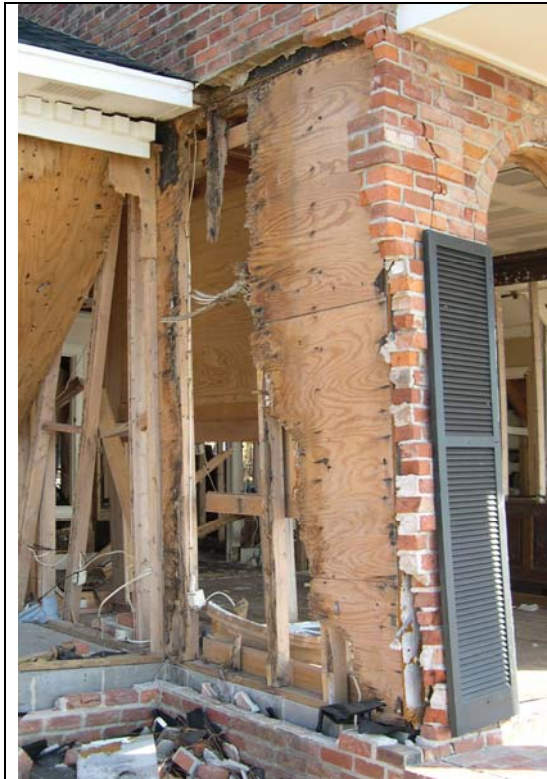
Damage to wood structural panel sheathing due to exposure to rain water.
